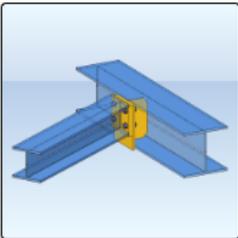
Civil engineering function button - Girder connection beam to web with 2 plates and stiffener (1211)
